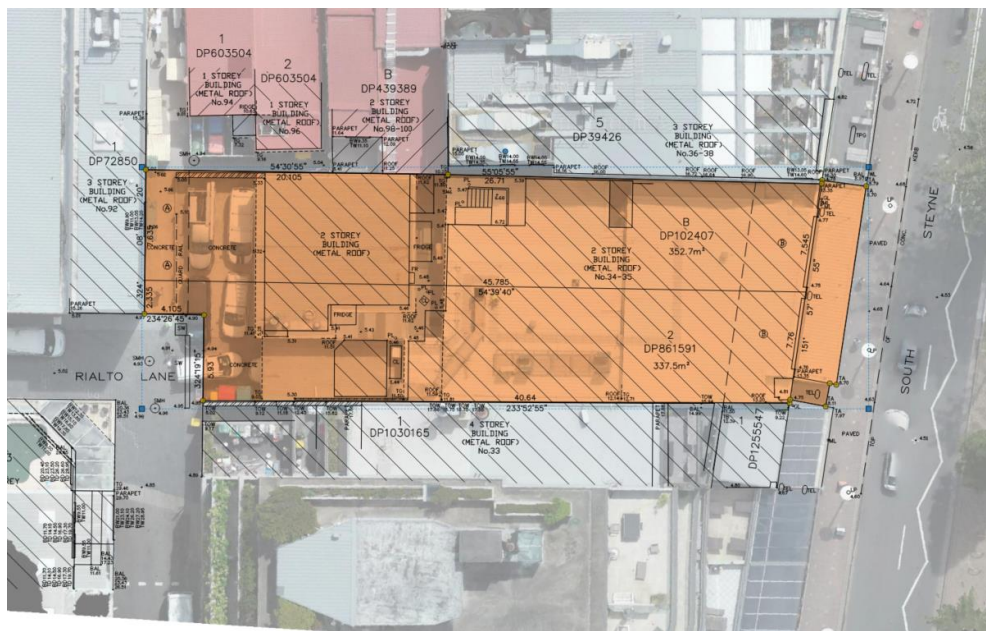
Marked up Site Survey Plan (Source: Hill & Blume Consulting Surveyors Ref 63239 Rev A)
